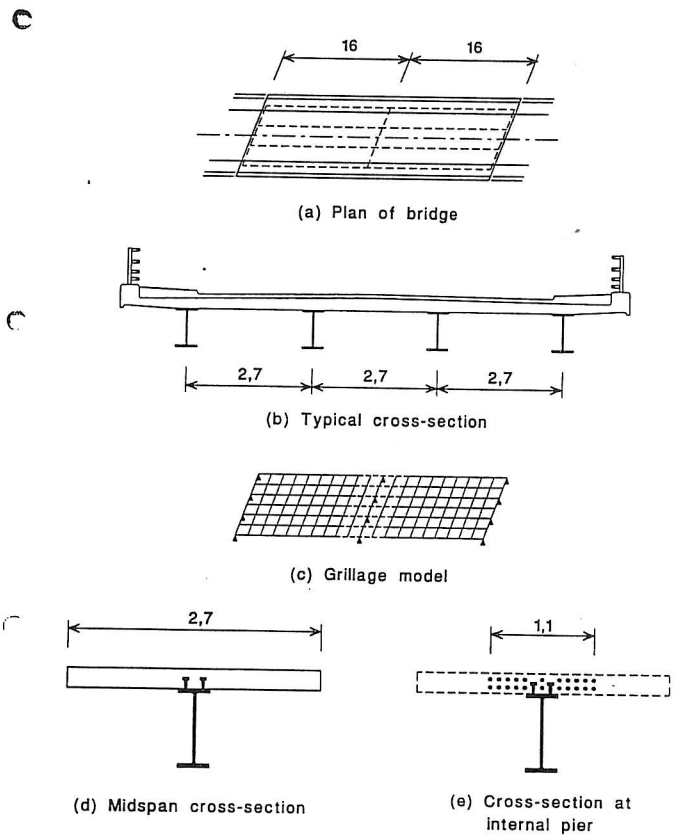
Typical grillage analysis for composite bridge, demonstrating the modelling of the slab as equivalent beam strips.
